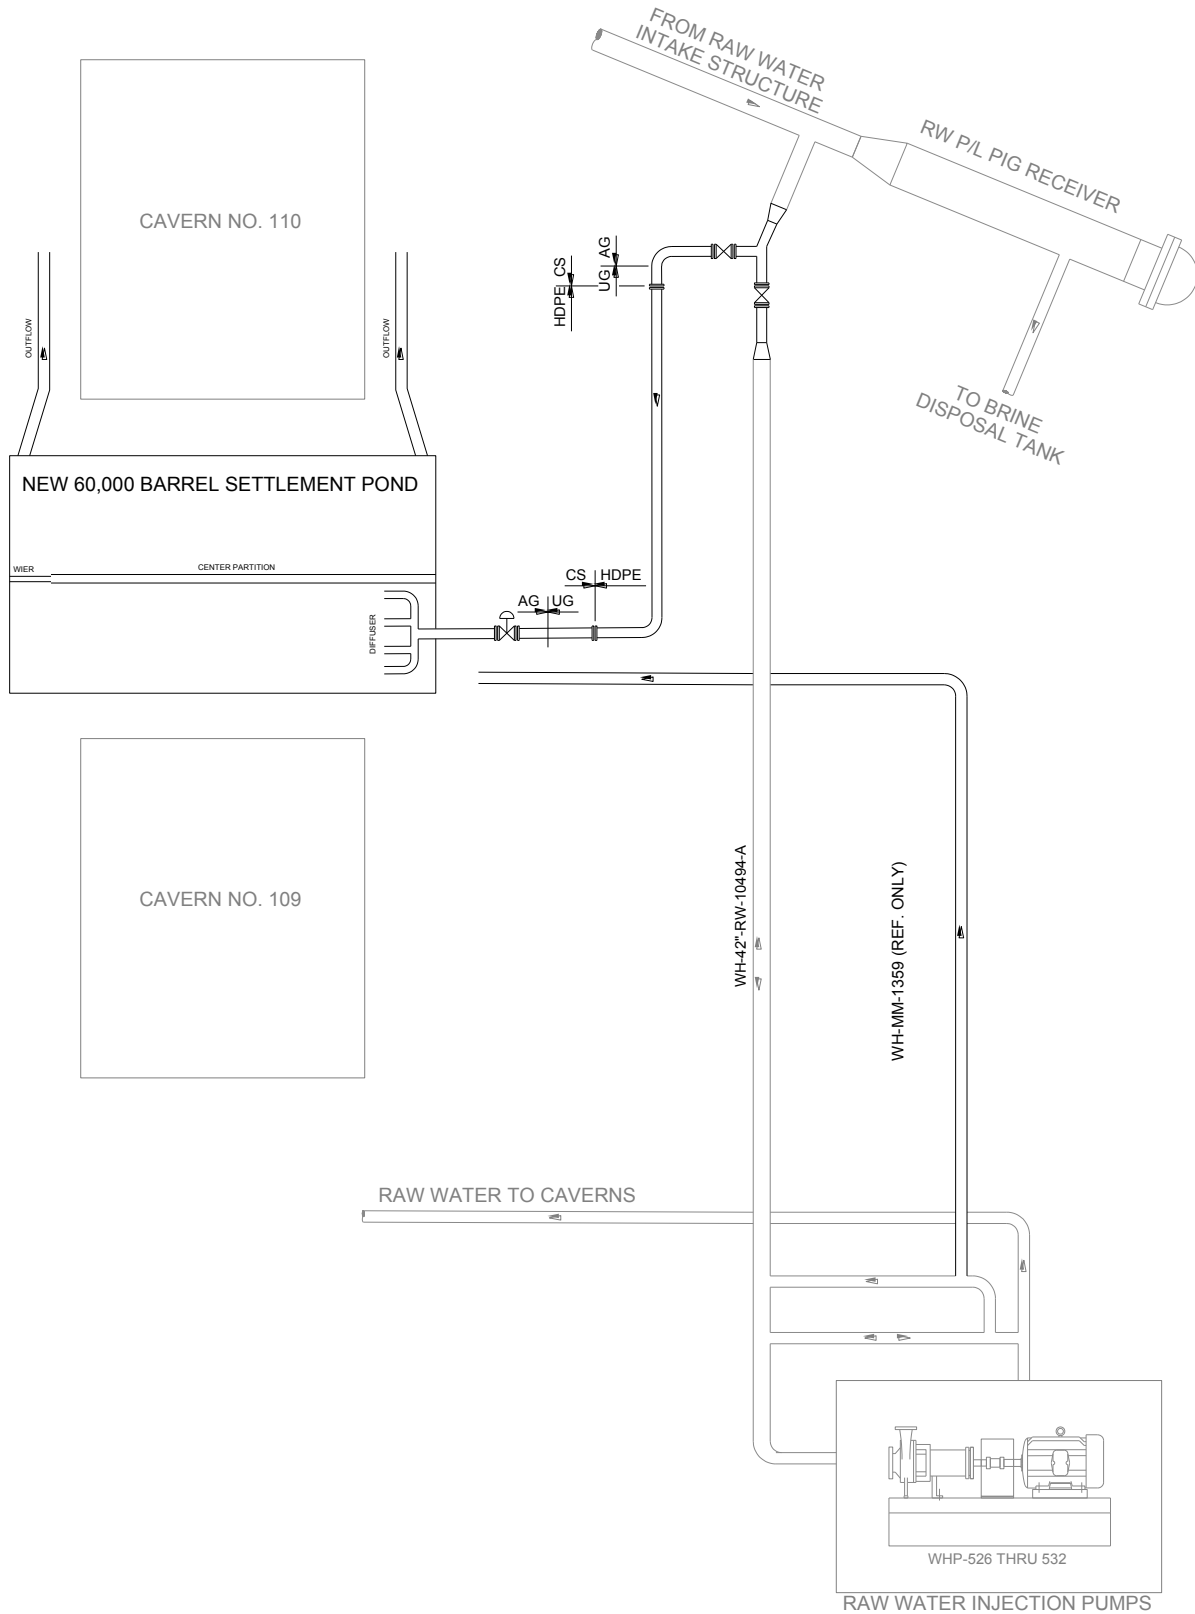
Partial Replacement of Existing 42-inch Pipe and 60,000-barrel Settlement Pond
